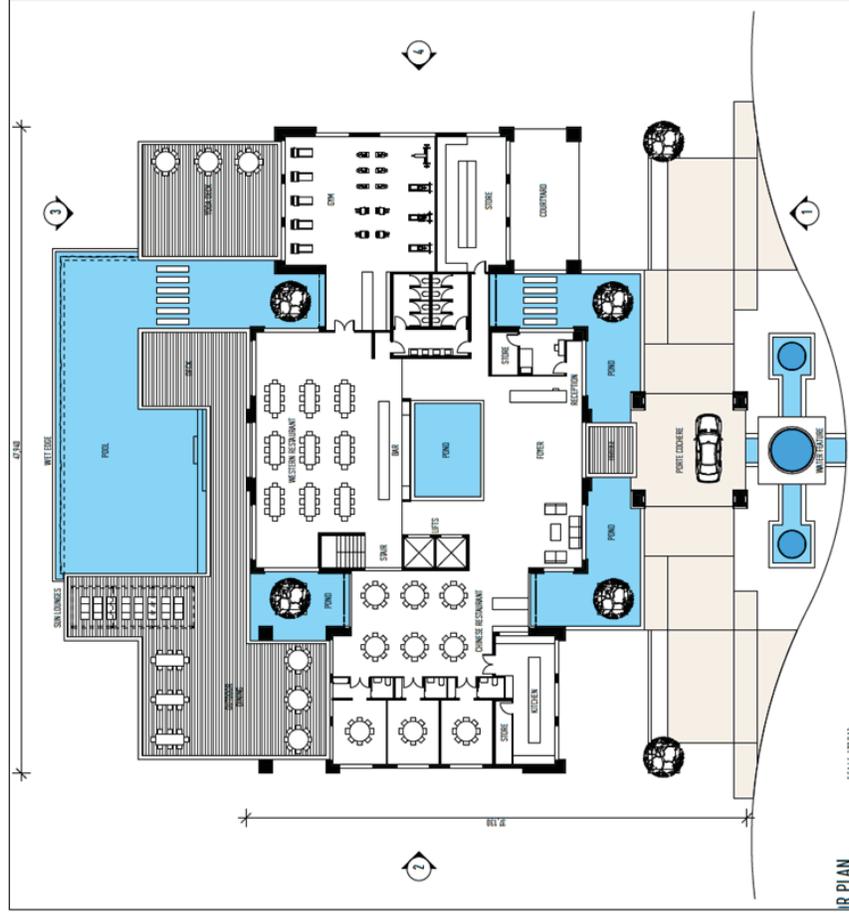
CENTRAL FACILITY GROUND FLOOR PLAN
